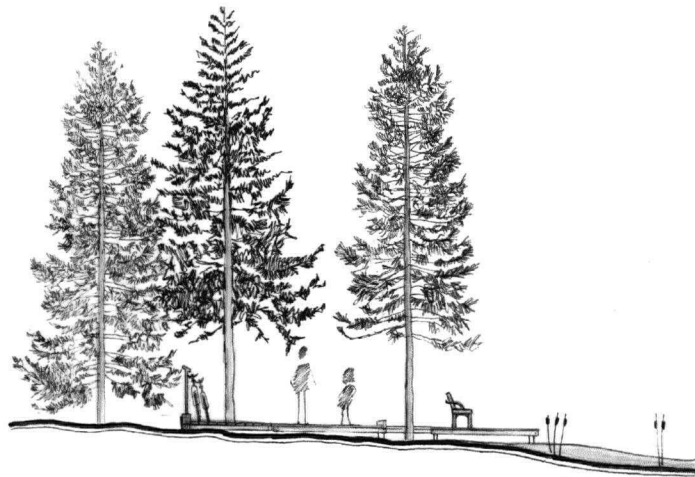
Sectional view of boardwalk detail showing railing for leaning bikes and a small viewing platform.
